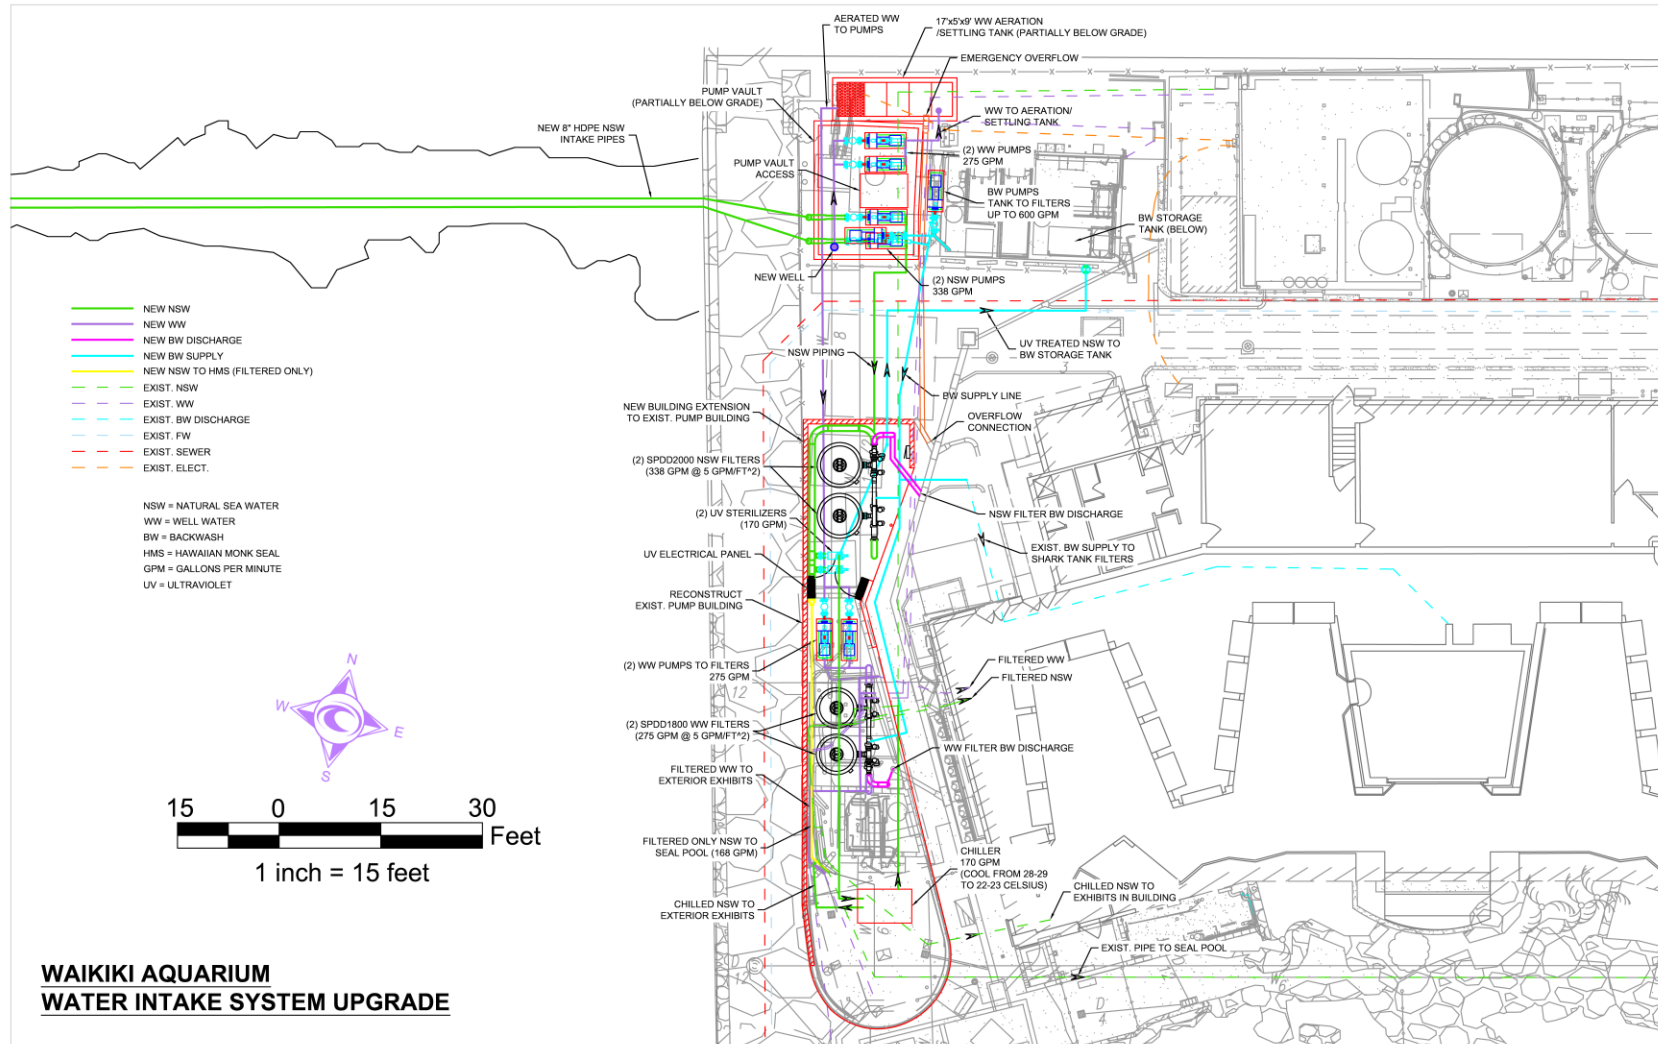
Conceptual Site Plan Layout of the Proposed Action
